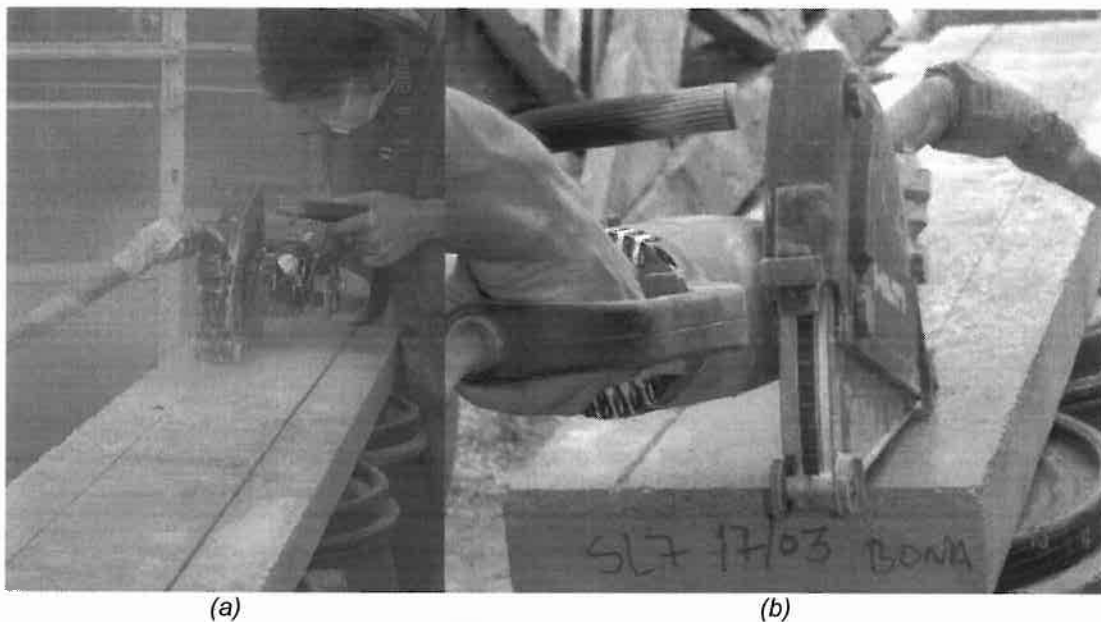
Making the slits (a), and diamond saw cutter machine detail (b).
